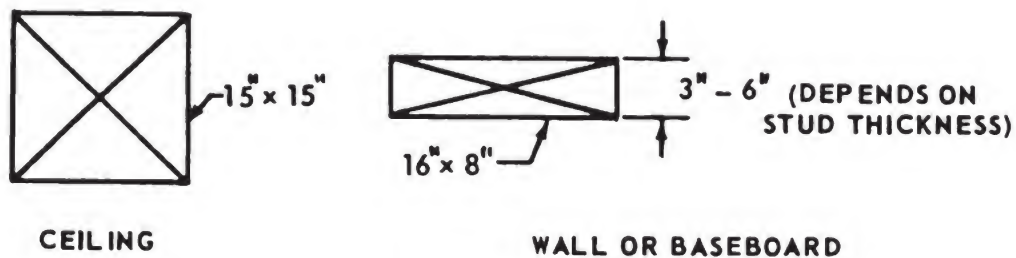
A. Ceiling diffuser. B. Wall or baseboard register.
